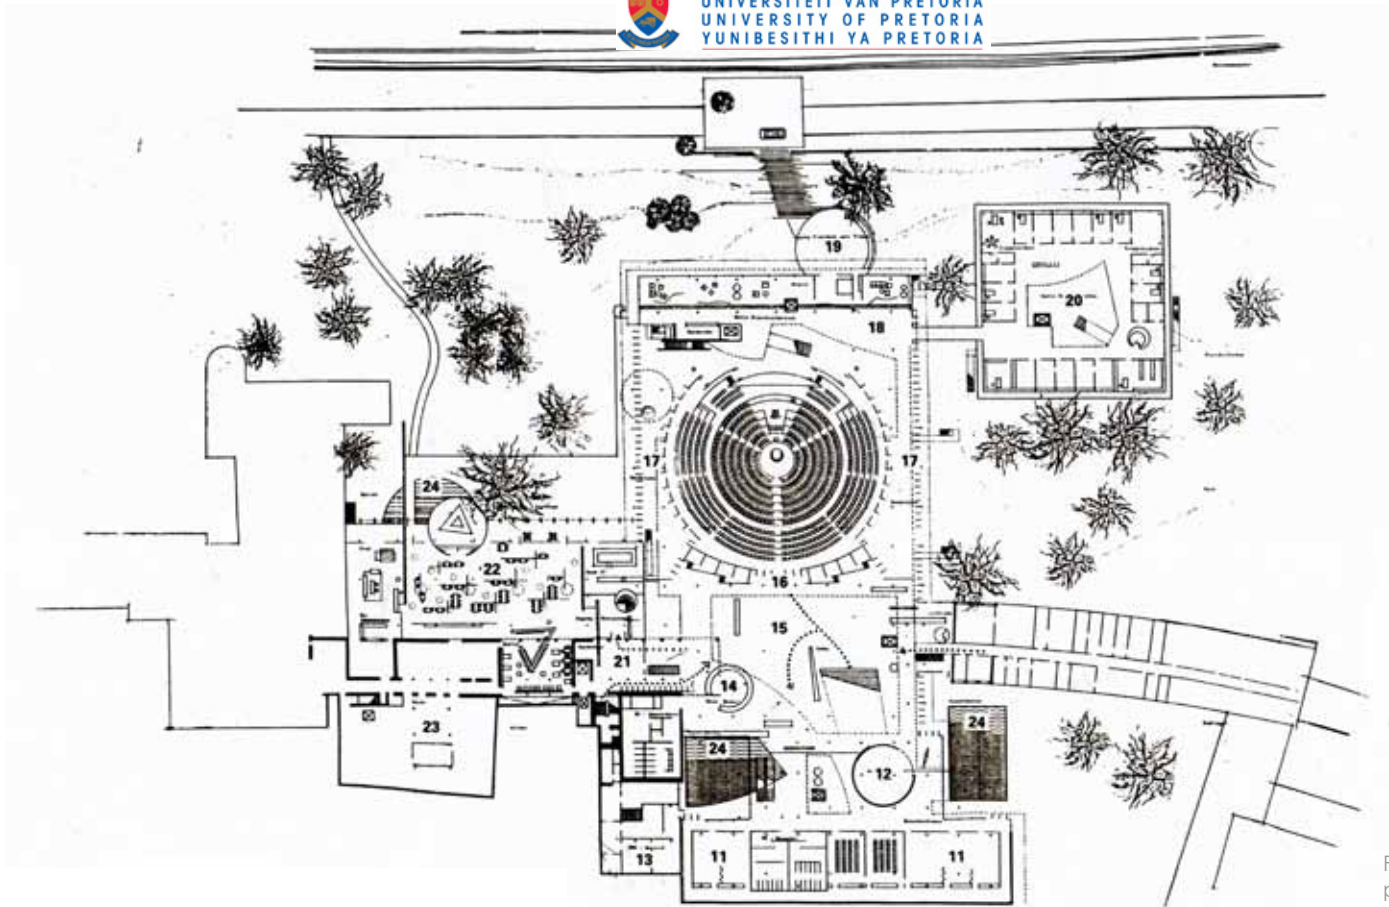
Groundfloor plan [Source: Architectural Review 1993, p 27]
